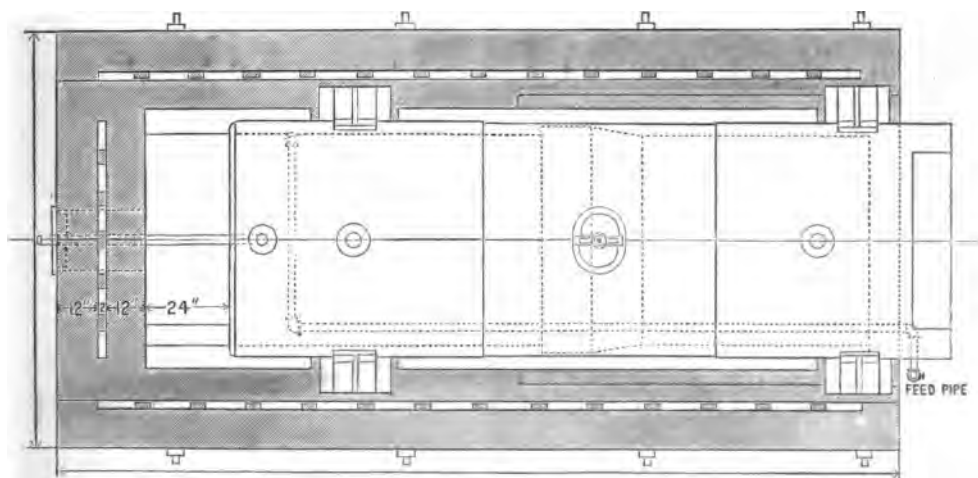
PLAN VIEW: SECTION THROUGH CENTER OF BOILER.
